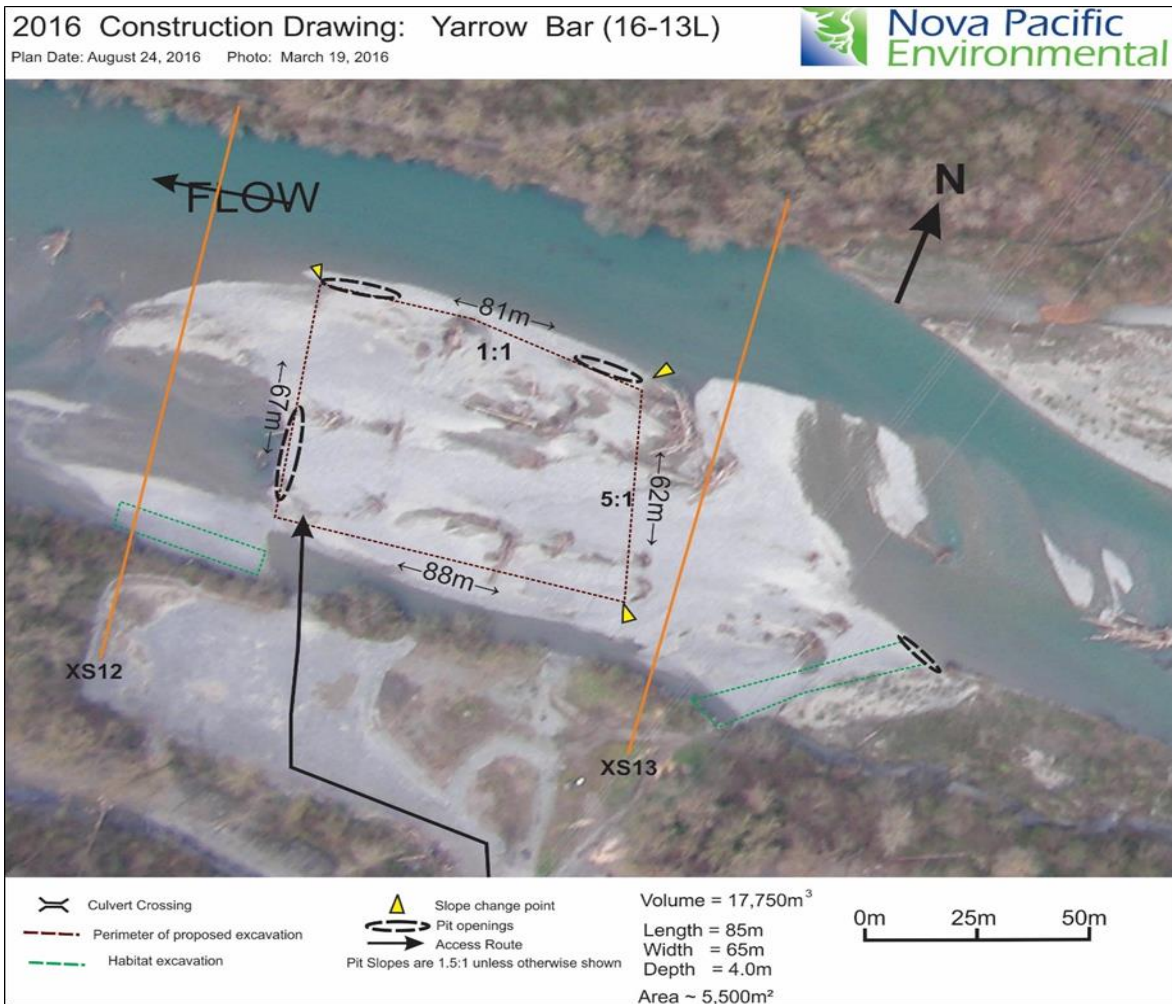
Aerial view of the Yarrow Bar excavation plan. Photo taken March 19, 2016, drawing – August 24, 2016.
